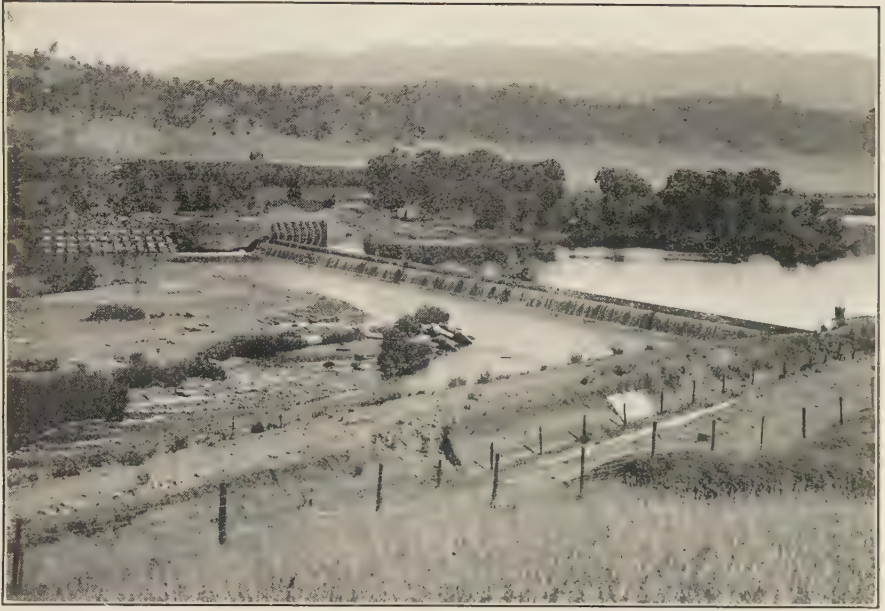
FIG. A.—Capay diversion works on Cache Creek, Calif. View shows brush revetment weighed down with concrete blocks. Yolo Water & Power Co., Calif.
